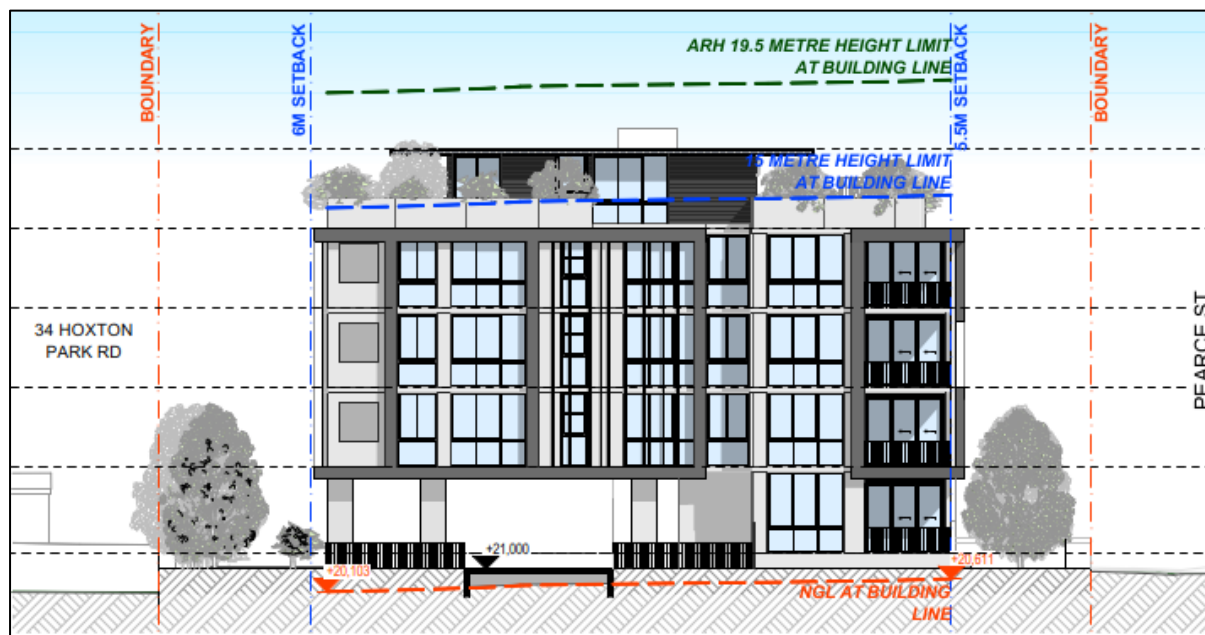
Proposed West Elevation (Source: Mackenzie Architects)
